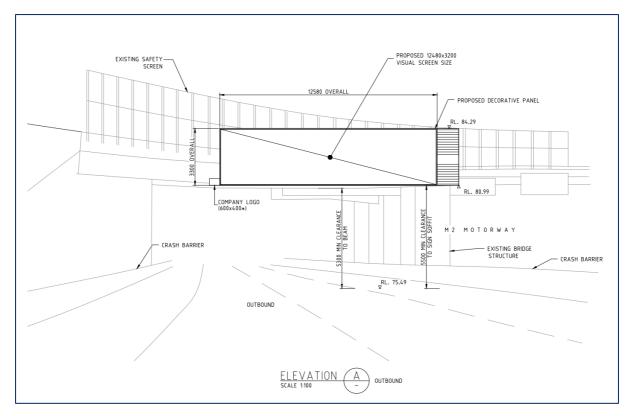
| Plan of the proposed sign (Source: Applicant's SEE)
